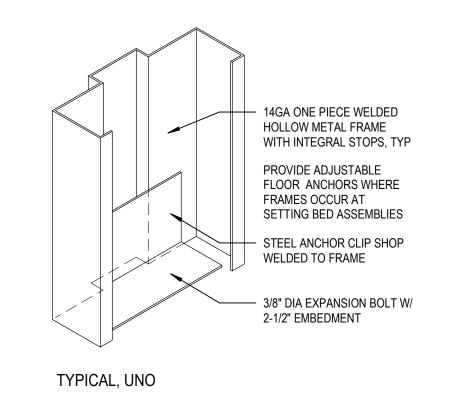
DETAIL - INT - DOOR - FRAME ATTACHMENT @ METAL FRAME OPENINGS - HEAD A8.00 SCALE: 3" = 1'-0"
